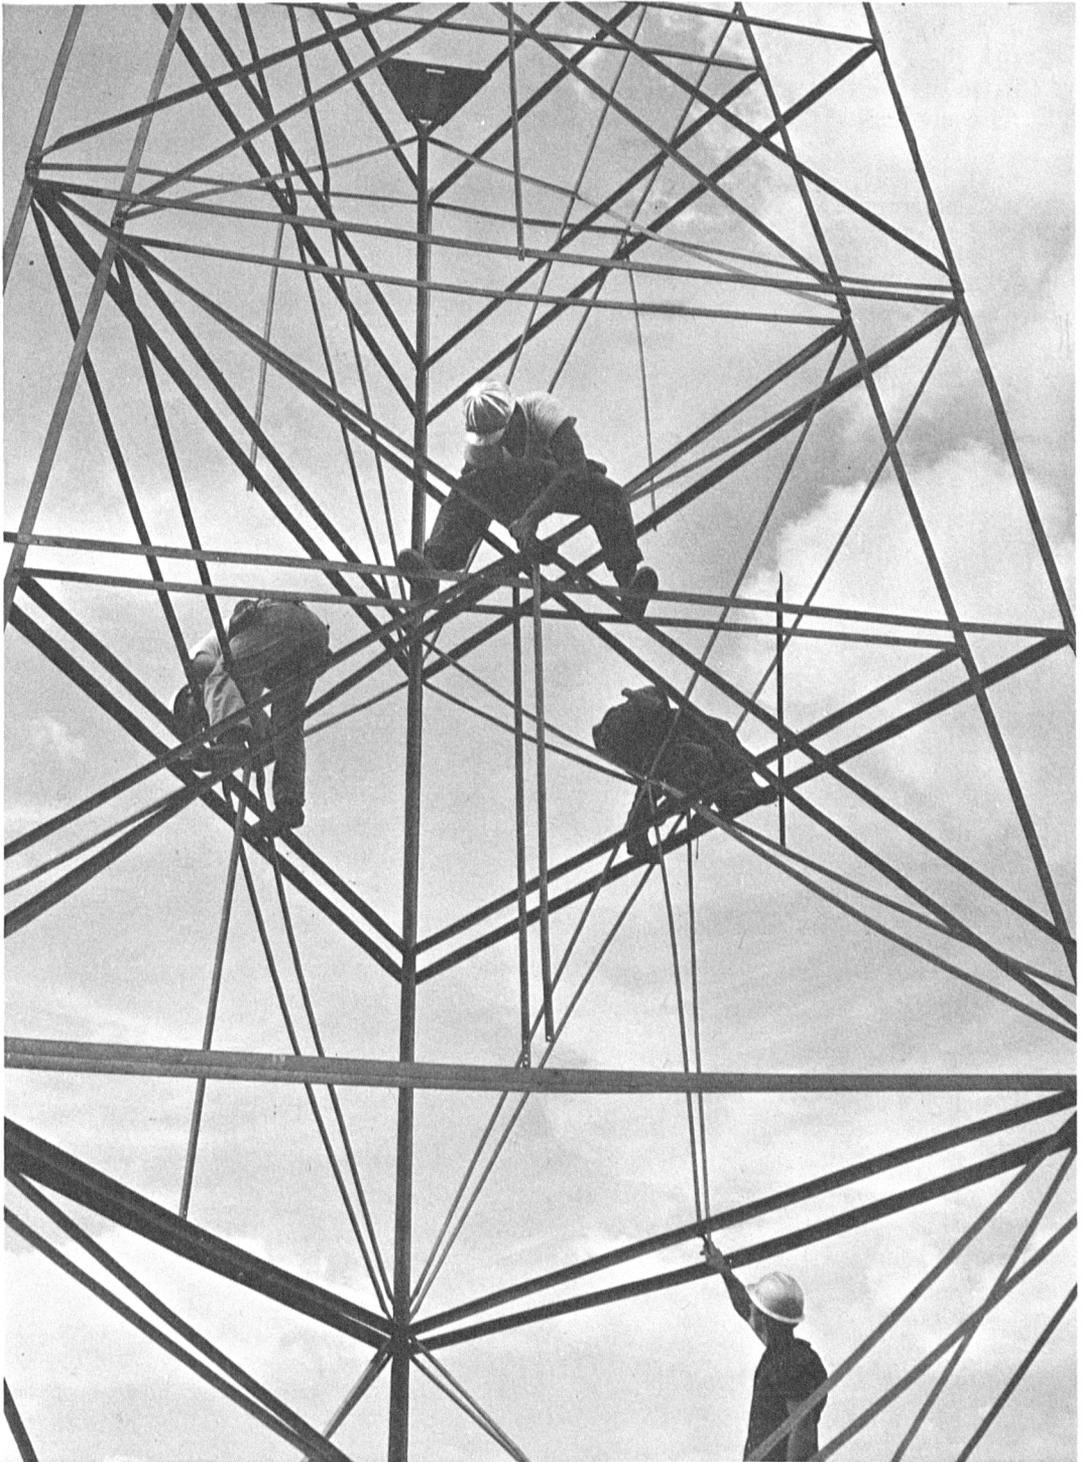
Erecting the vertical stiffening members in the 77-ft. section.
